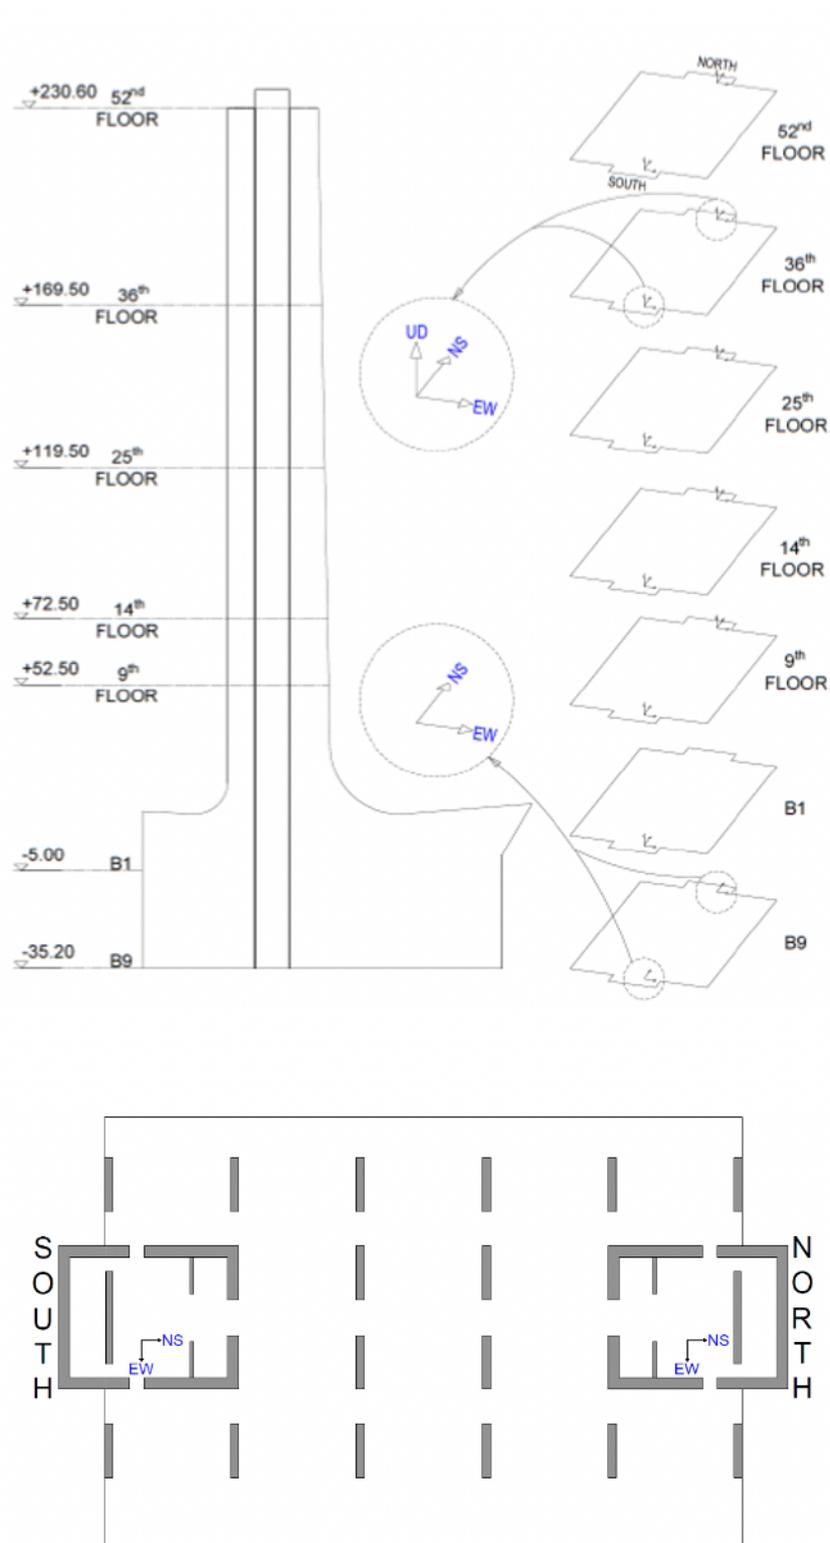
Location and orientations of the sensors in the Sapphire building (vertical elevation and plan view).
